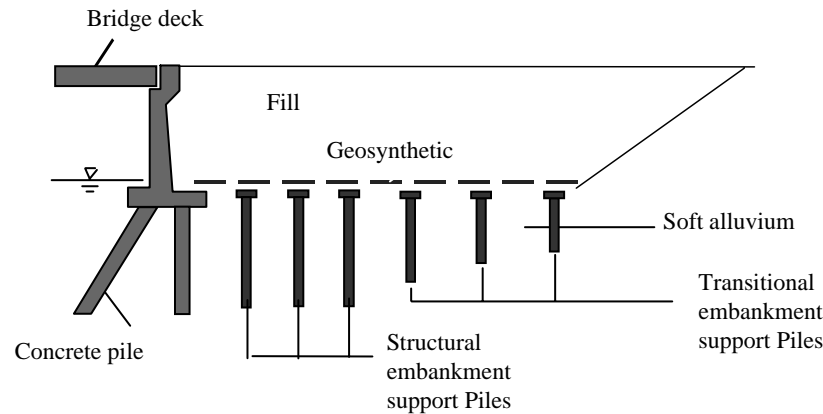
Bridge Approach Support Piling (Reid and Buchanan, 1984)
